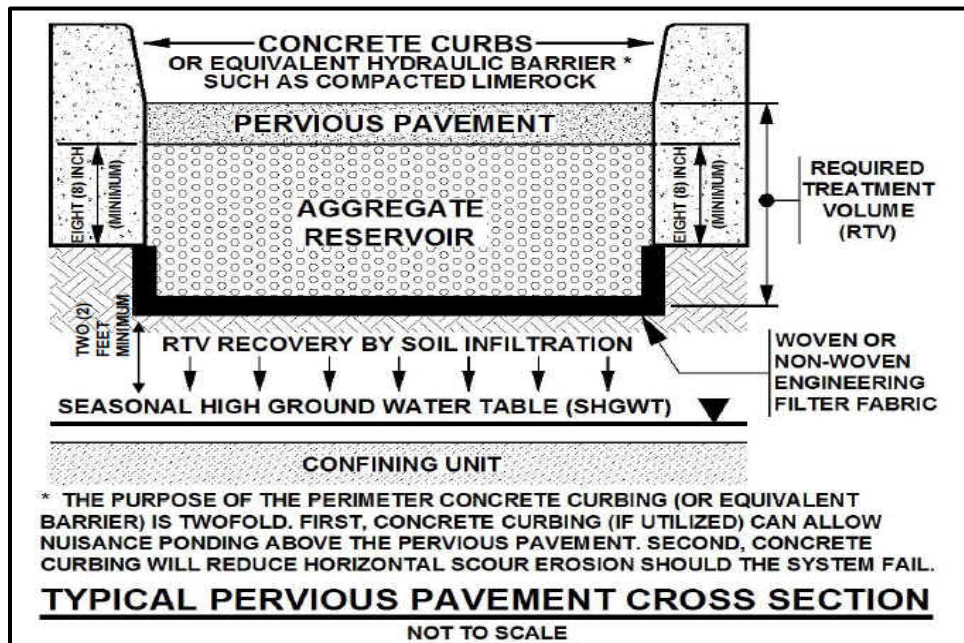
Typical Pervious Pavement Cross Section (Pinellas County)
